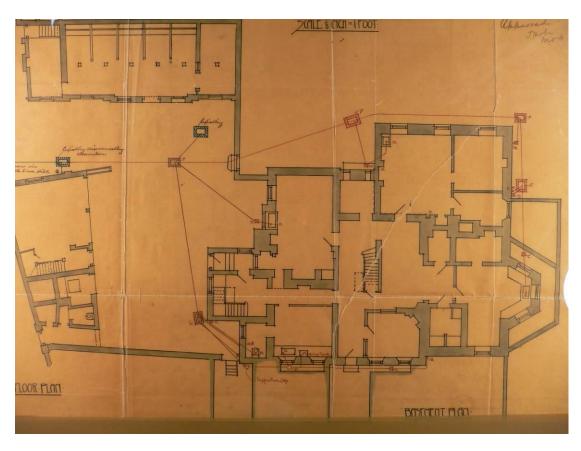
Basement plan of Heath House, from a drainage plan of 1902 (Camden Archives)
